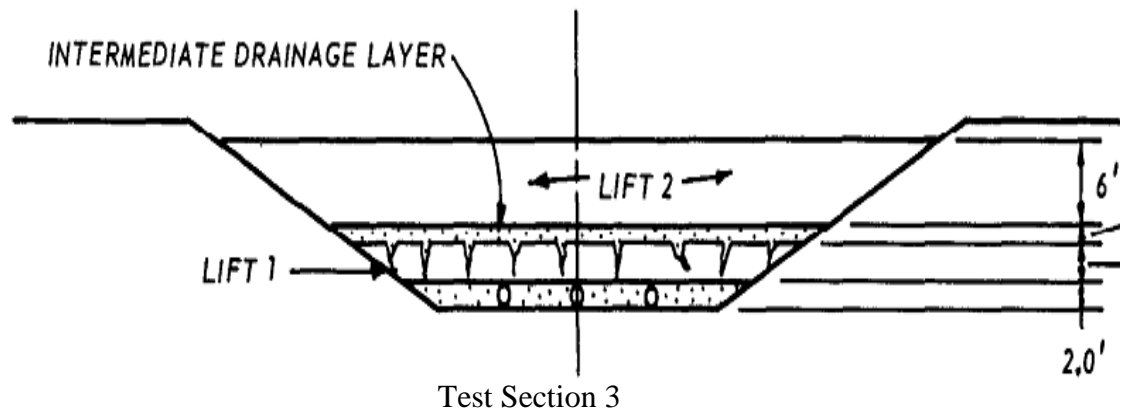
Connection arrangements between under-drainage layer and intermediate layer for vacuum test sections (after Hammer 1981)
